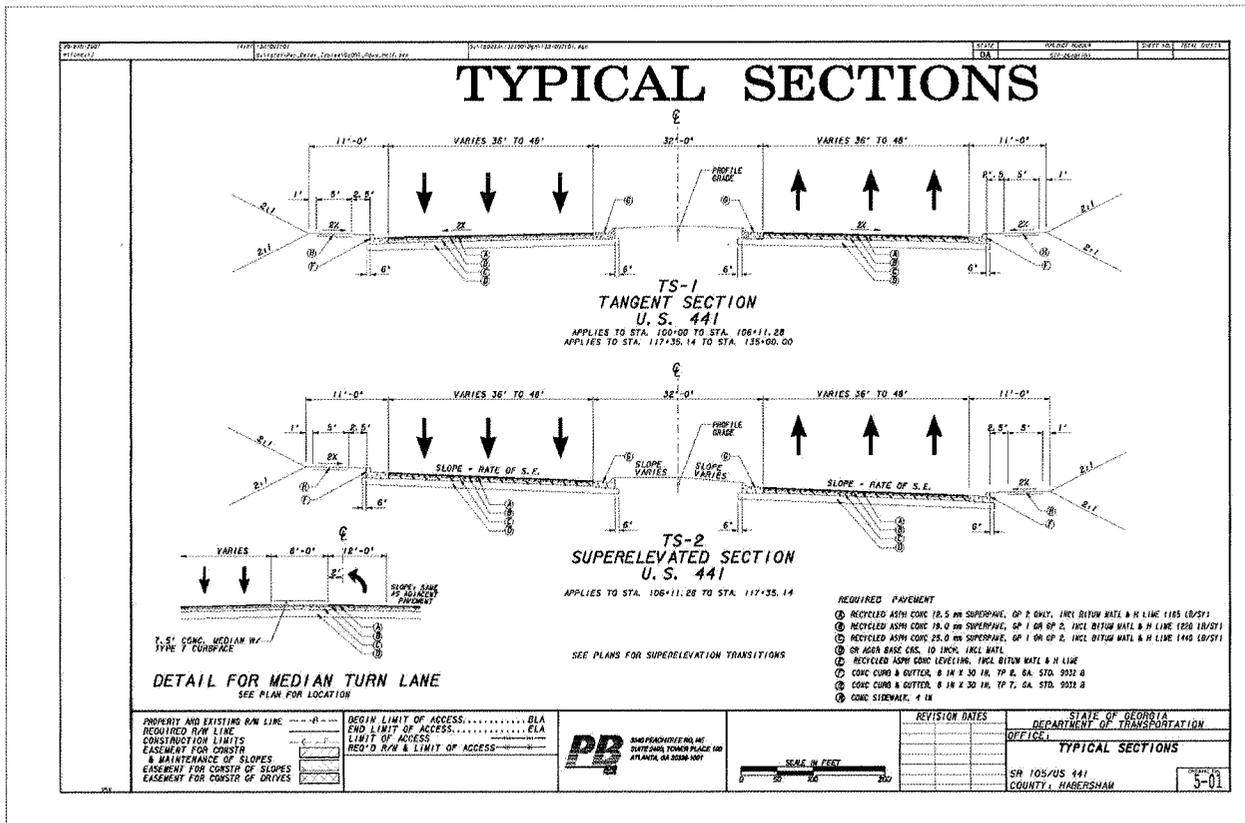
Typical Sections, SR 105/US 441 from Cannon Bridge Road to SR 365
